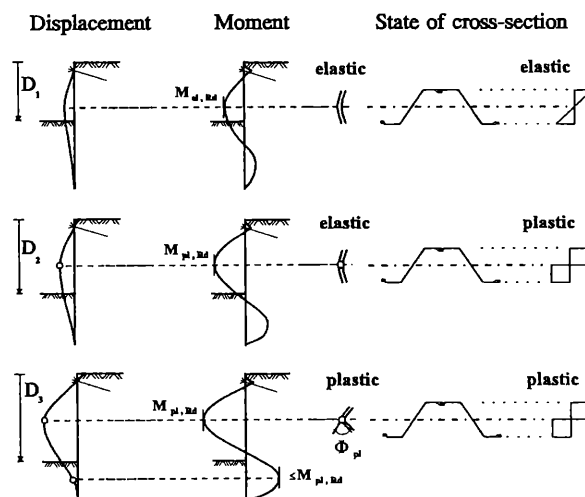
States of stresses in a sheet pile wall during an excavation (Hartmann-Linden 1997)
